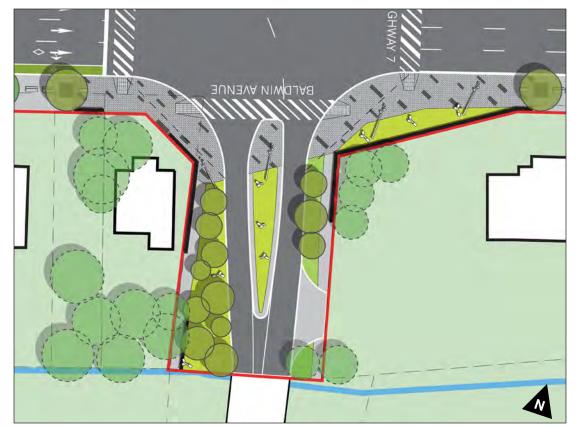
Baldwin Avenue Gateway (see Section 3.2.3.4 for enhanced detail).
